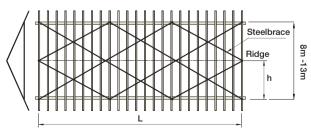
Steelbrace layout for long roof, spans 8m to 13m
